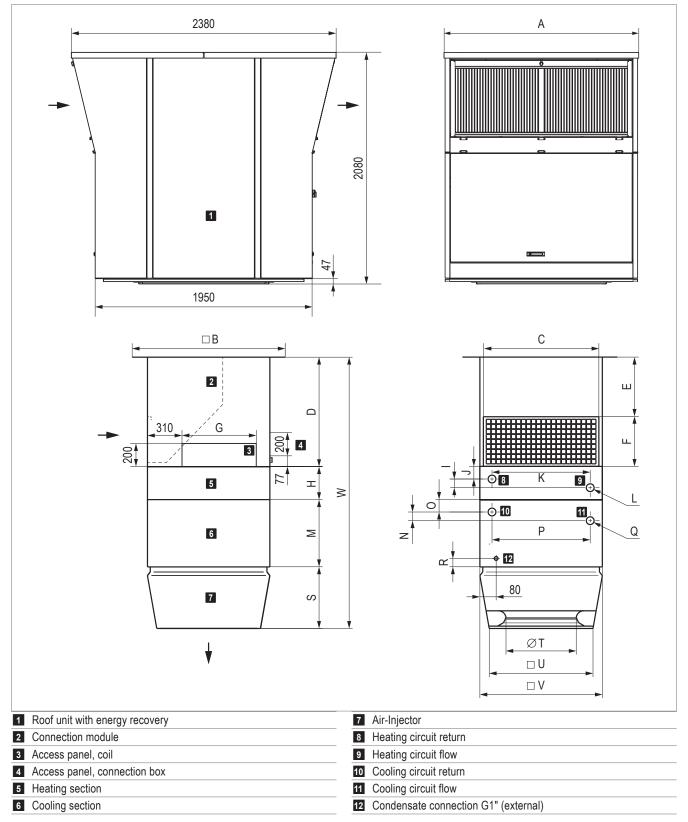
RoofVent® RHC dimensional drawing (dimensions in mm)
